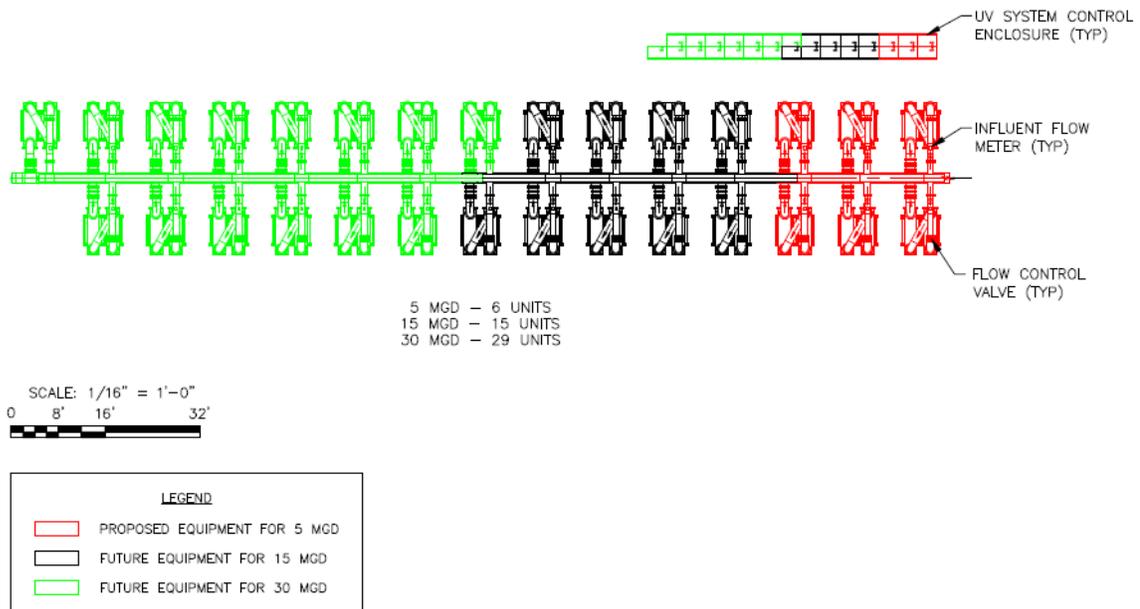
Plan B UV Disinfection System Preliminary Layout
